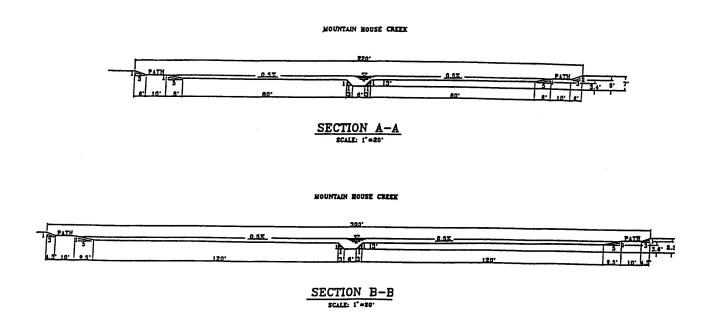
TYPICAL CREEK CHANNEL CROSS SECTIONS
